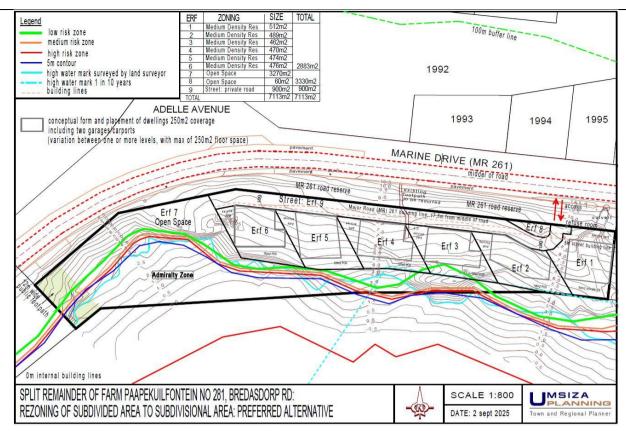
Proposed site development plan – Alternative 5 – final preferred layout.
